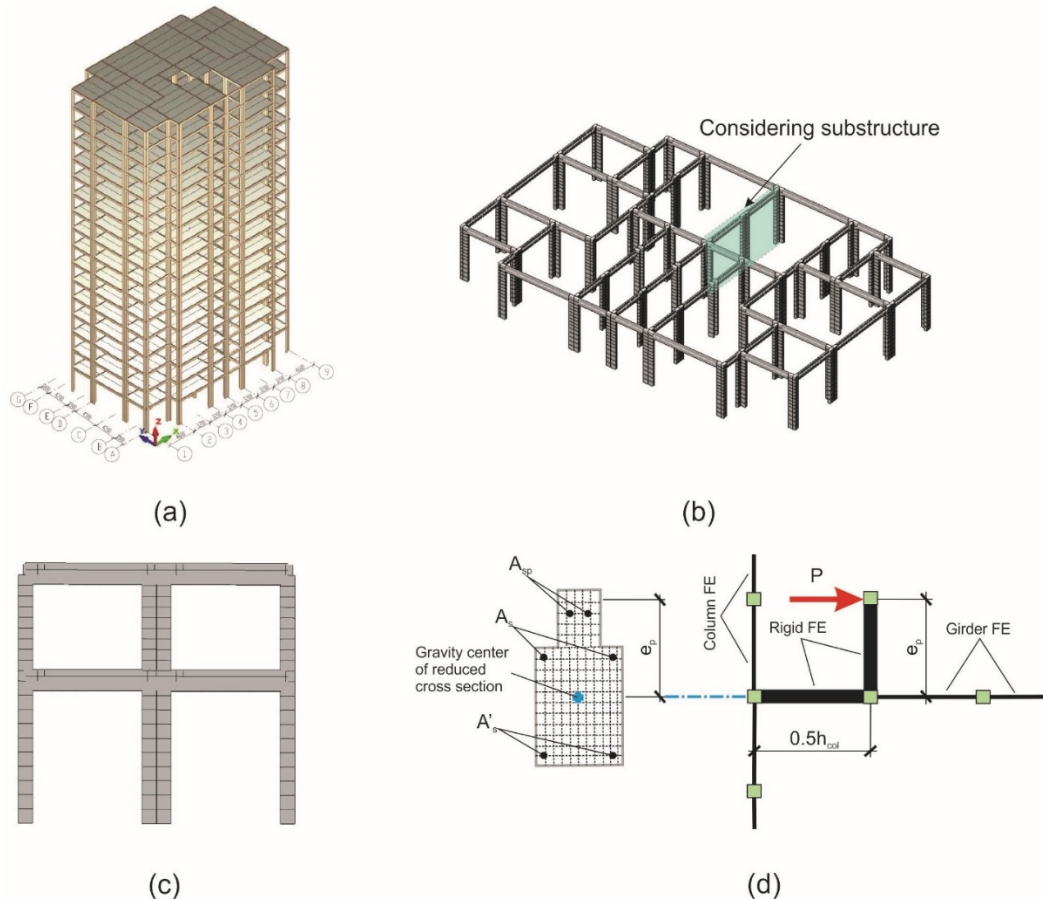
Finite element calculation model of multi-storey RC building frame: first level model (a) second level model (b), substructure for performance simulation (c), scheme for simulating of prestressed girder (d).
